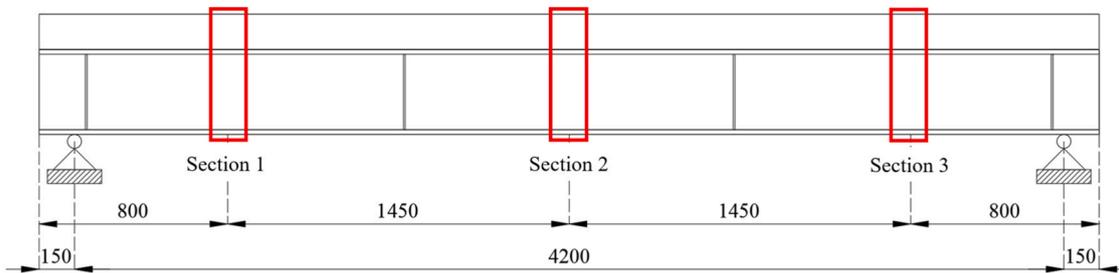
Sections where the thermocouples were installed at the fire tests (dimensions in mm).
